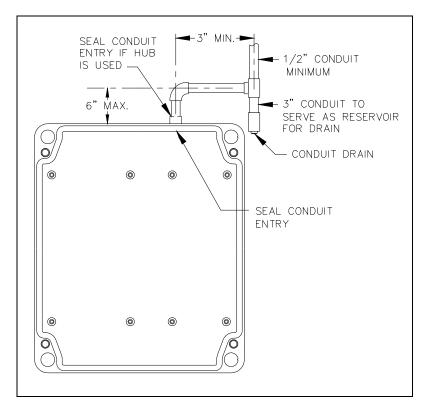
Model 246-700 & 256-700 - Top entry conduit installation details (NOT RECOMMENDED)
